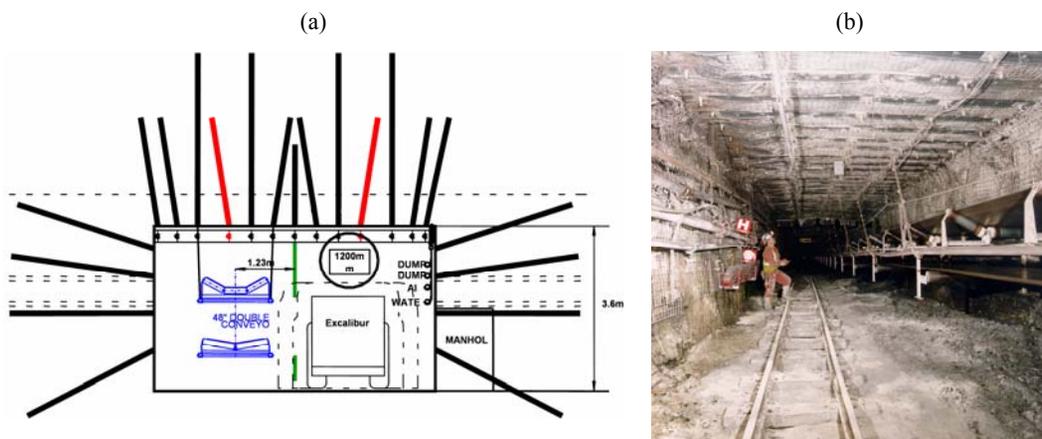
Rock bolted gateroad in one of the UK mines; (a) detailed scheme of rock bolting, (b) view of rectangular rock bolted gateroad.
